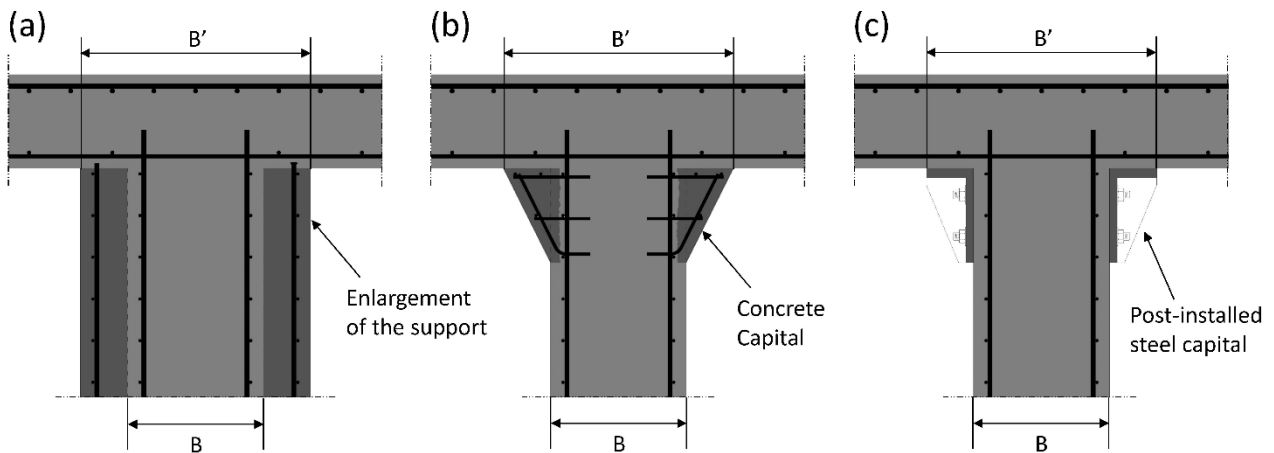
Strengthening of flat-slab by enlargement of the support: (a) column widening; (b) casting new concrete capital; (c) post-installing steel capital (adapted from Hassanzadeh [5]).
